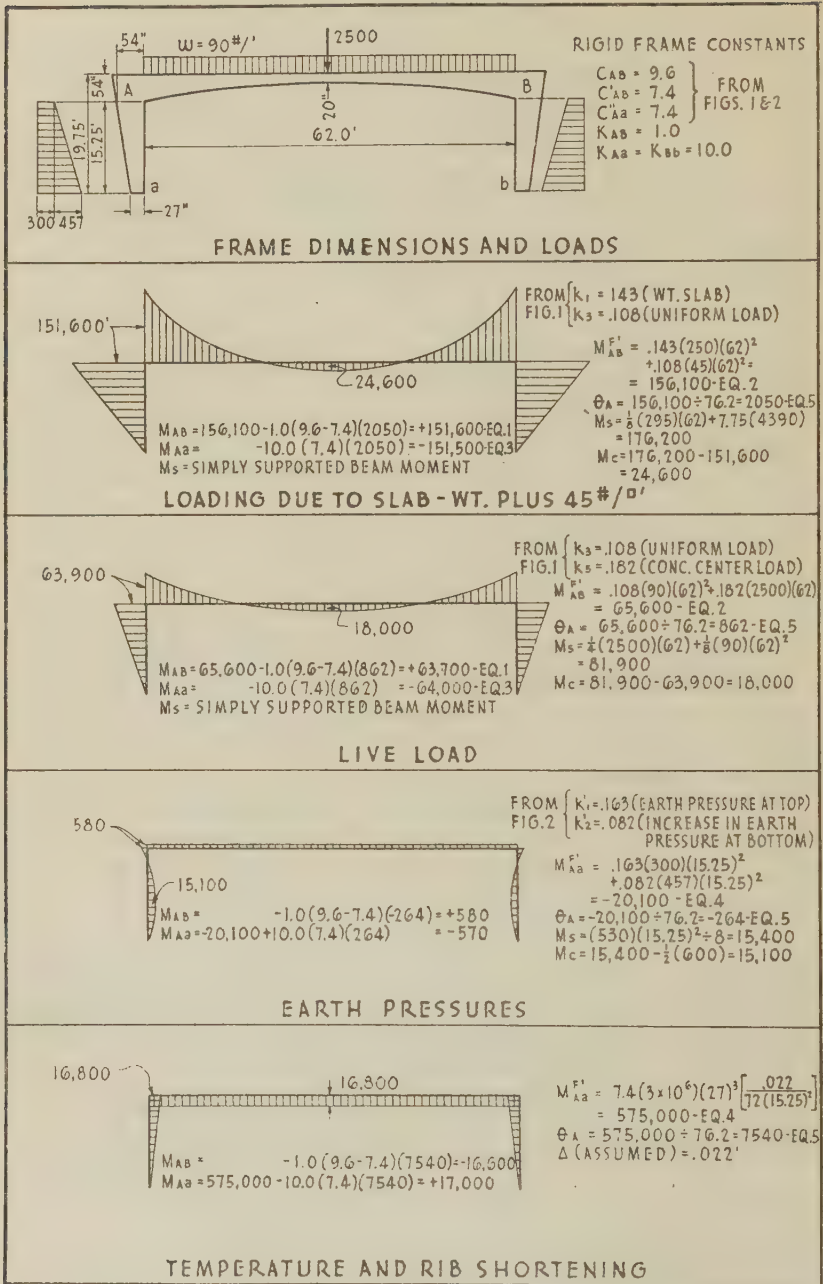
SOLUTION OF SINGLE SPAN RIGID FRAME BRIDGE—
